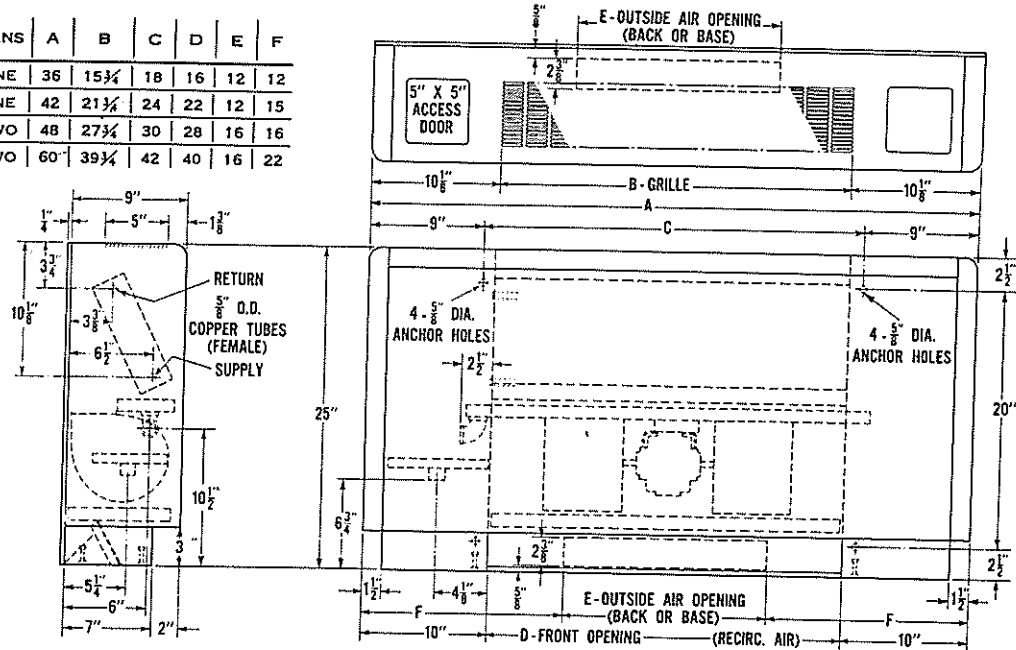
Dimension Drawing of UniTrane Vertical Cabinet Model.
